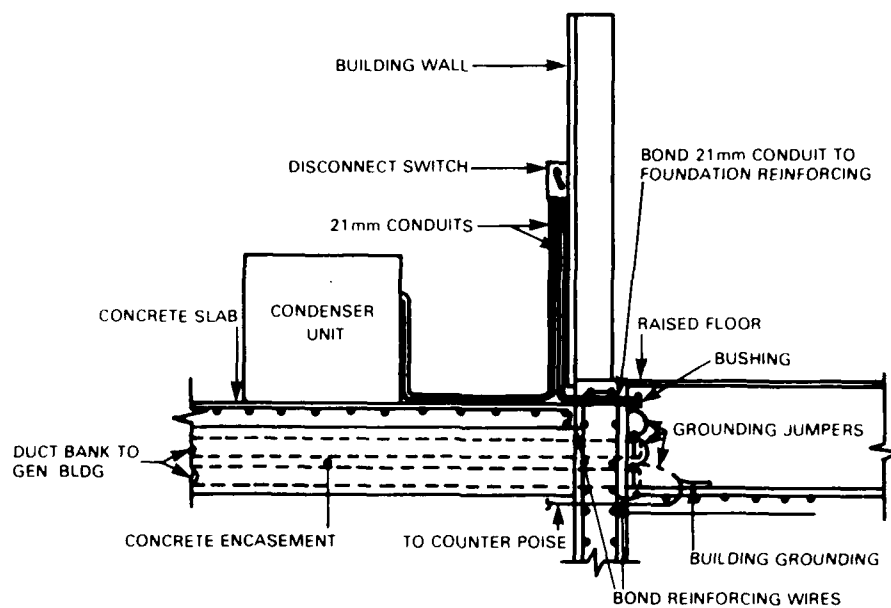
Detail showing penetration treatment of condenser unit conduit and prime power conduits at building entry.
